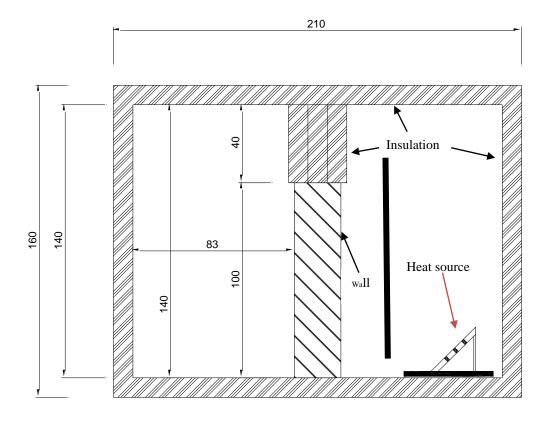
Section A-A is showing the position of the wall in the test room.
